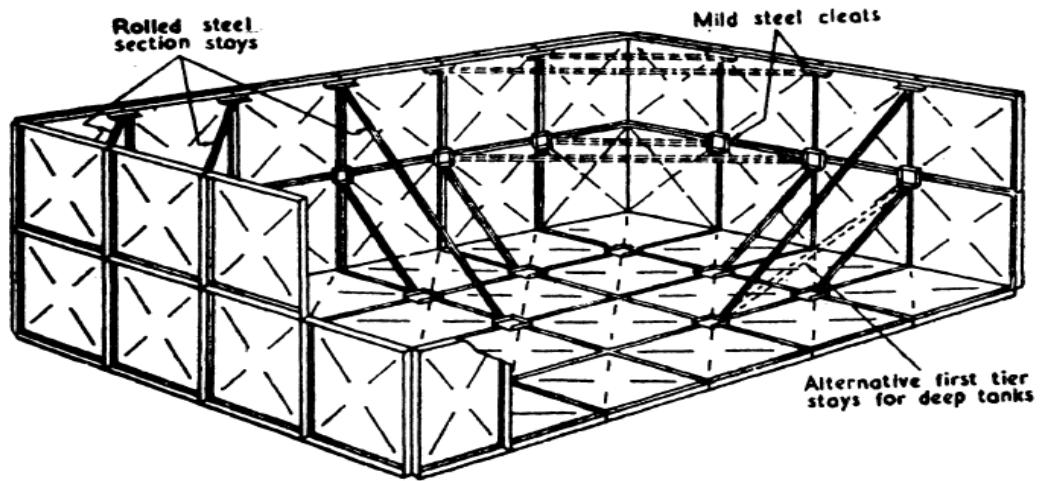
Typical press steel sectional rectangular tank with external flanges
